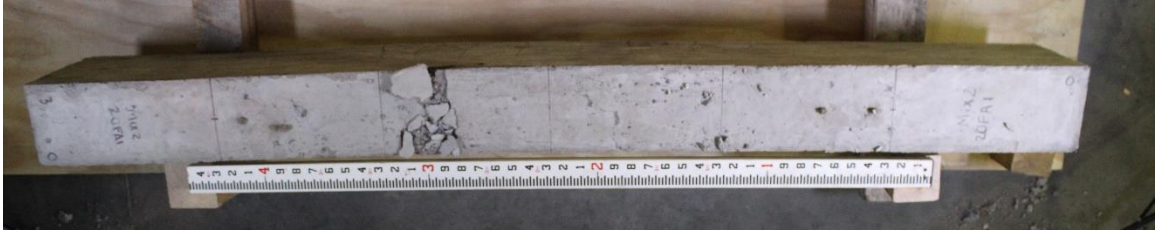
Mixture 2 (20FA1) beam #30: concrete beam top view.
